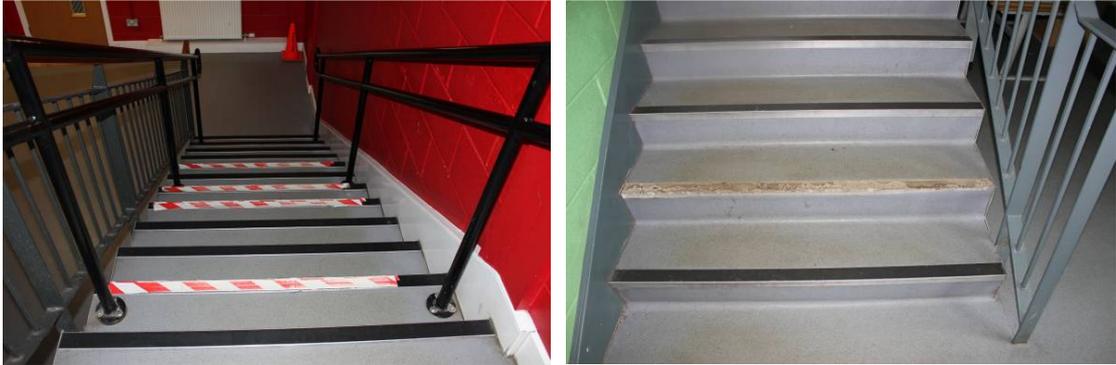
Examples of poor quality construction with stair nosings coming off stairs at two schools.
